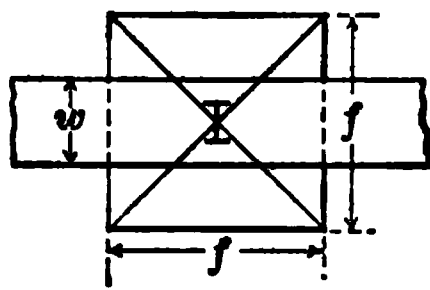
Square Supporting Area. Wall and Concentric Isolated Load
